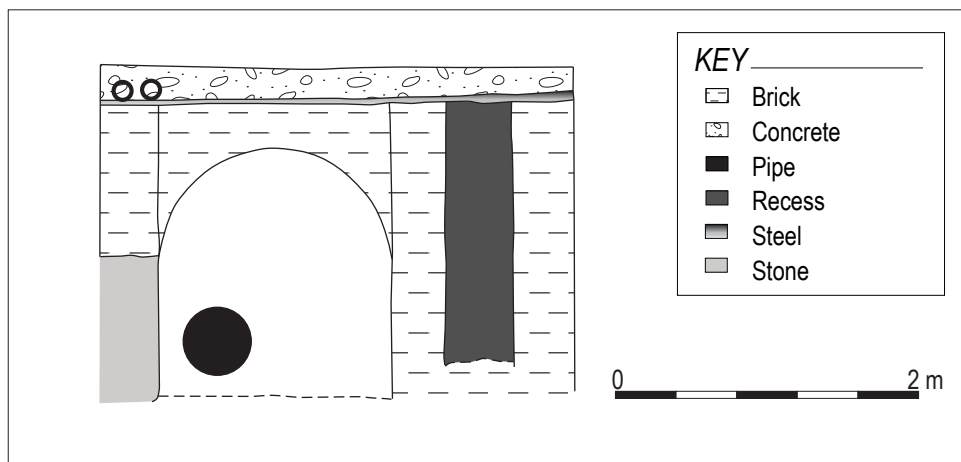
East facing elevation of the chamber of Crawley Tunnel on the Mound
